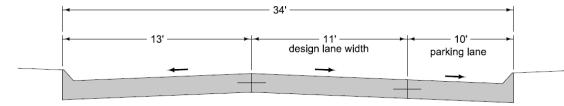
Two lane roadway with a parking lane and a standard paver width of 34 feet.
